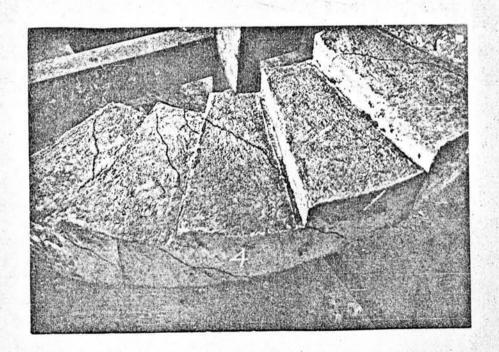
View of the torsional cracks at the top face of the stairs
